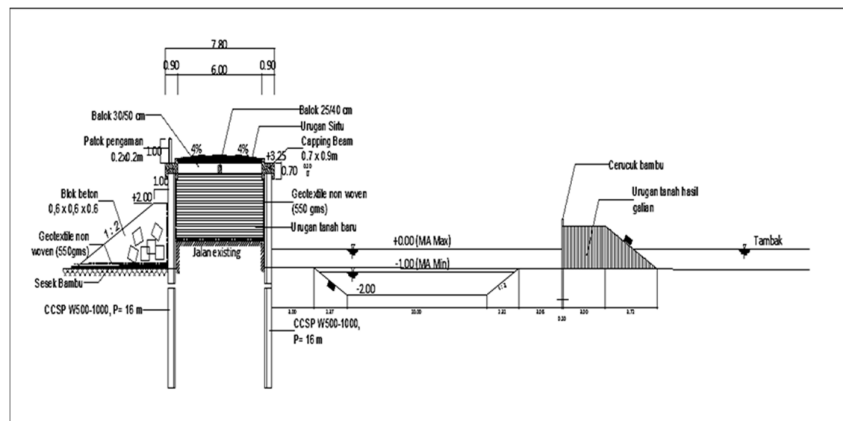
Parapet Wall and Corrugated Concrete Sheet Pile Reinforcement (CCSP)
